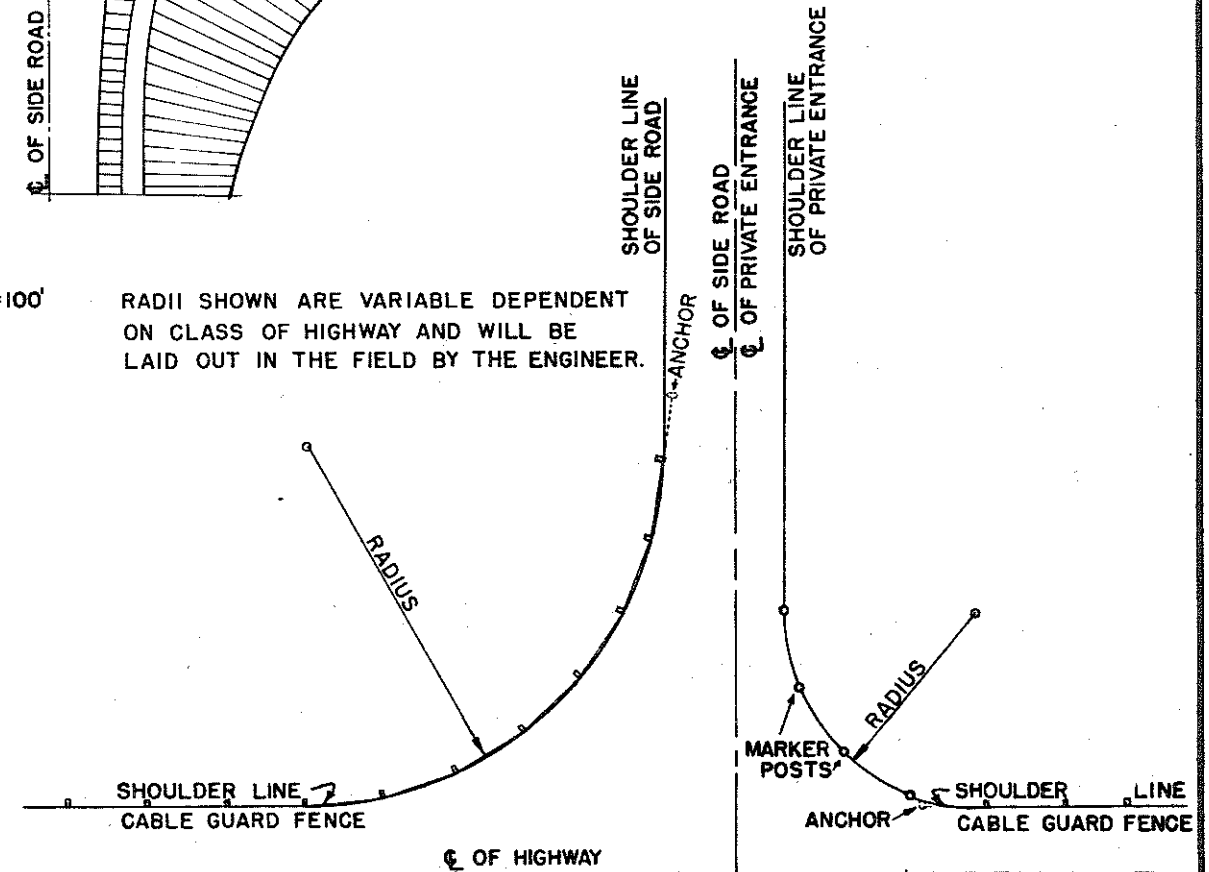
DETAILS OF PRIVATE ENTRANCE APPROACHES	J-3.1.1
